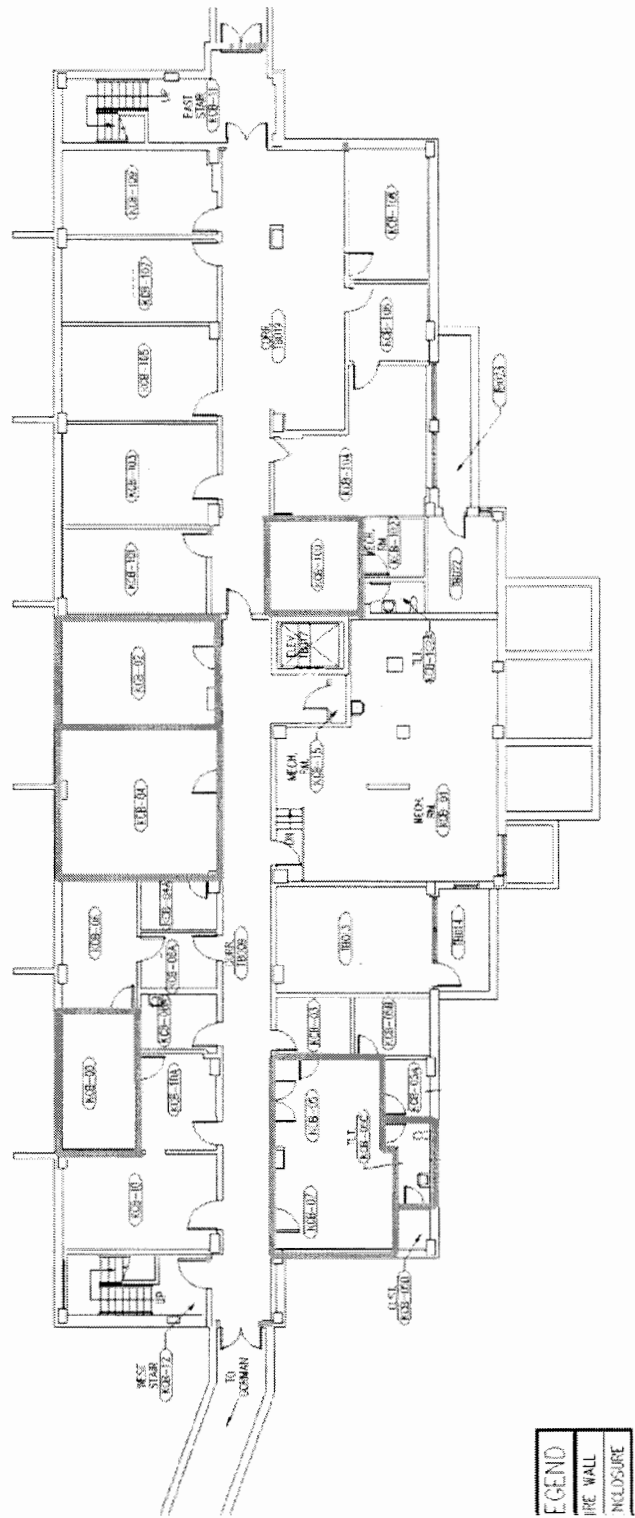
Floor plan diagram of the basement level of KCB. Authorized use areas outlined with dark grey lines.
